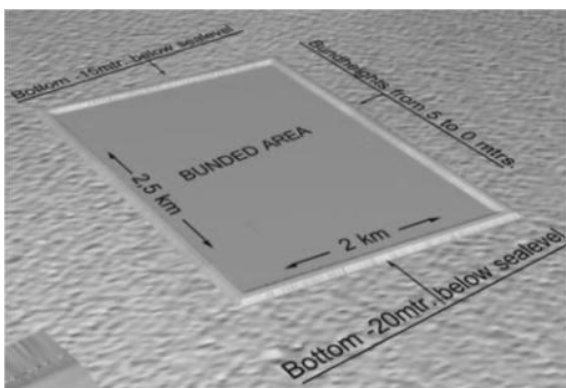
Submarine disposal facility for contaminated mud at 20 m water depth.
